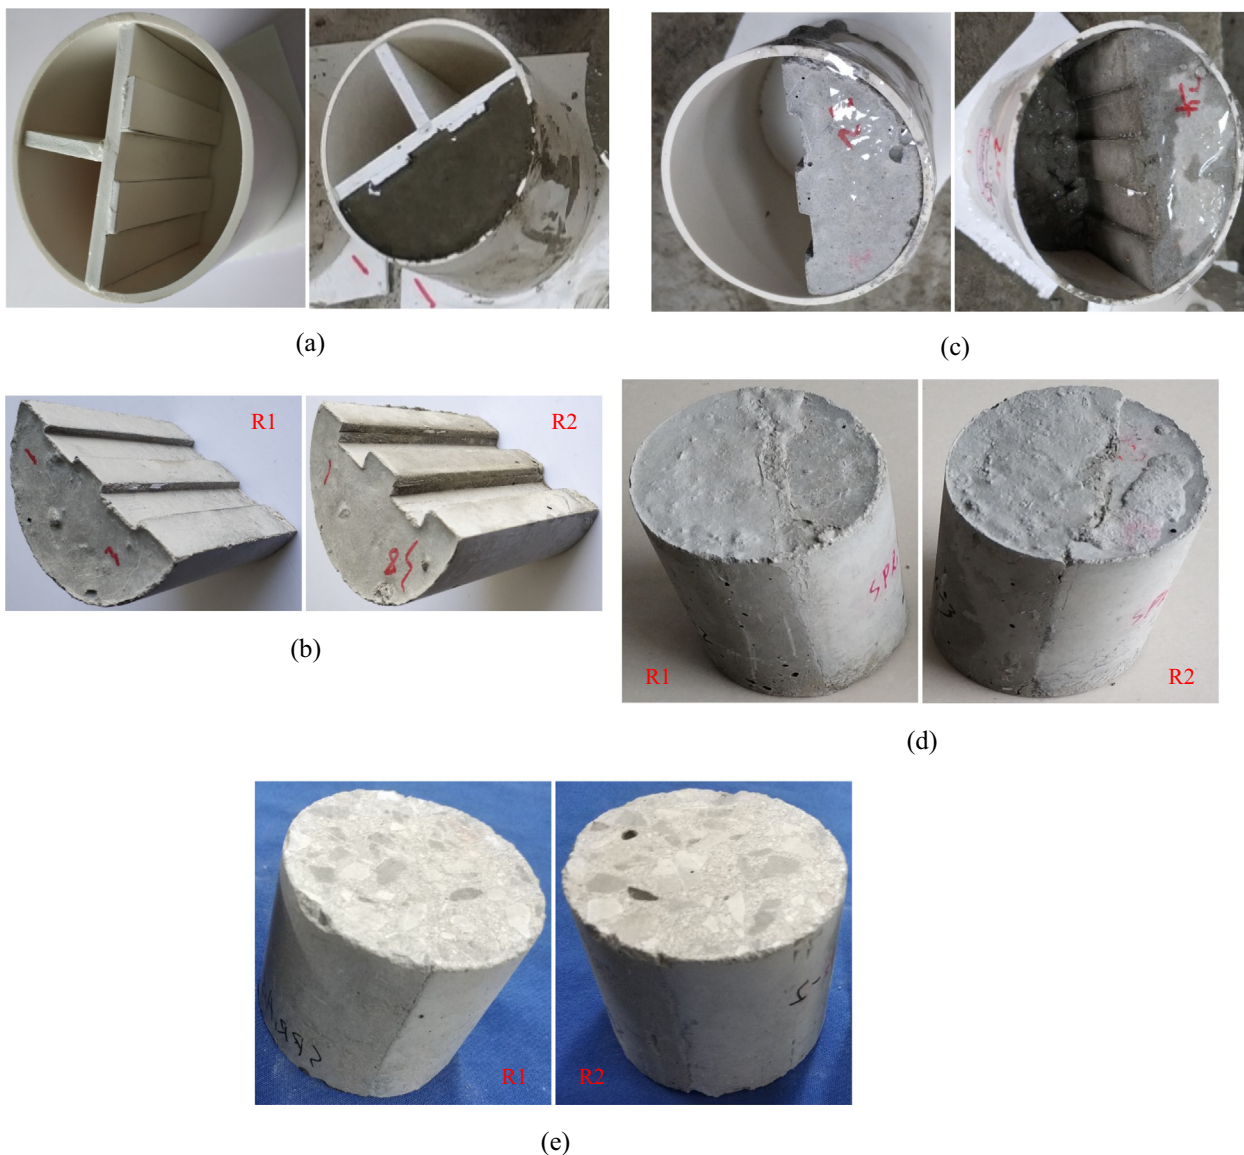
Formworks and cylinder specimens: (a) formwork for casting old concrete; (b) old concrete semicylinders; (c) formwork for casting new concrete; (d) cylinder specimens before cutting; and (e) cylinder specimens after cutting. (Note: the new concrete semicylinder is on the left and the old concrete semicylinder is on the right in each figure of (d) and (e).)
